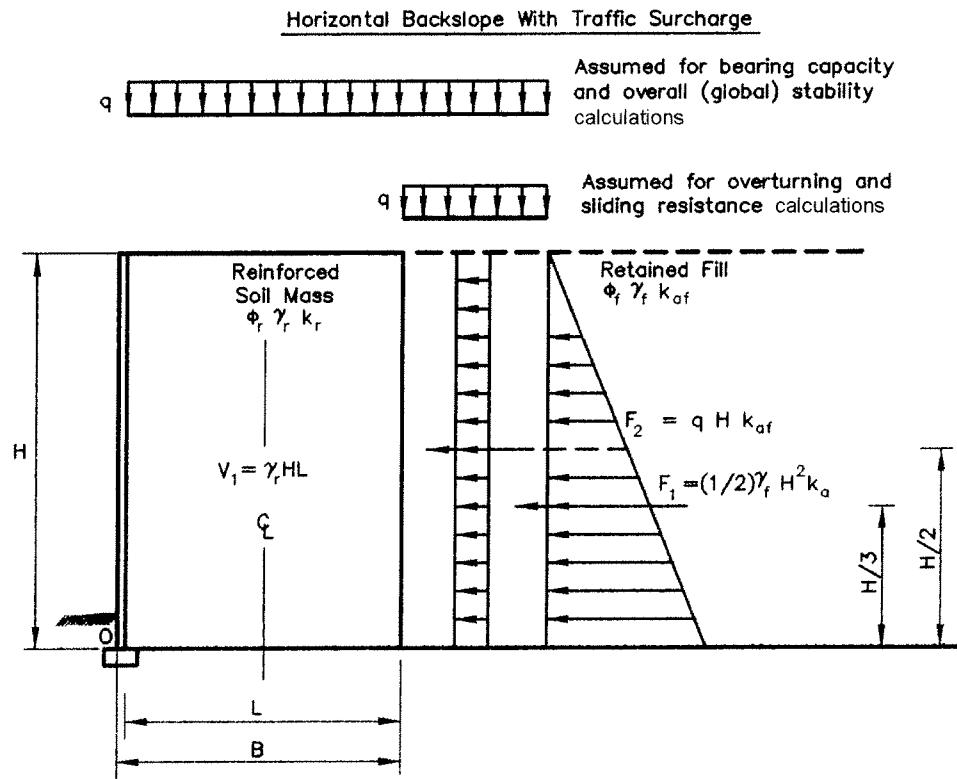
External Stability for Wall with Horizontal Backslope and Traffic Surcharge.
